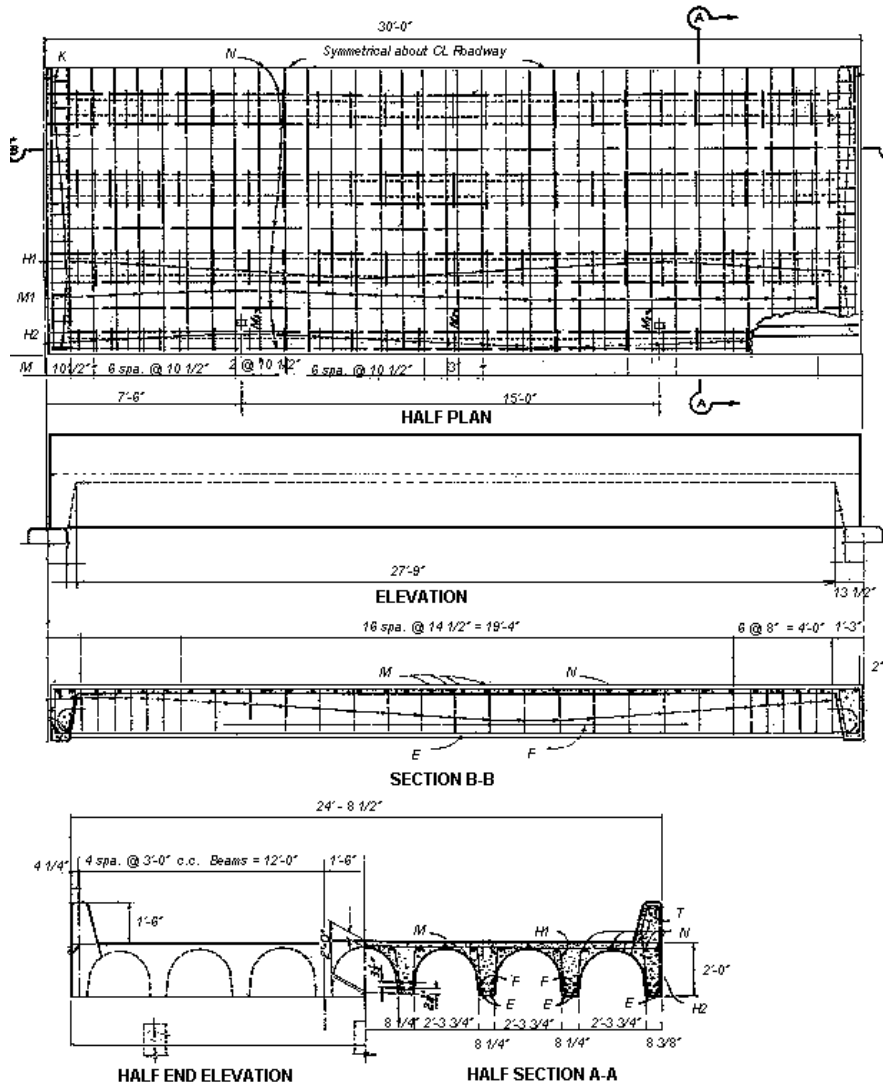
Structural Details of Pan-Girder Bridge in Buda, TX
